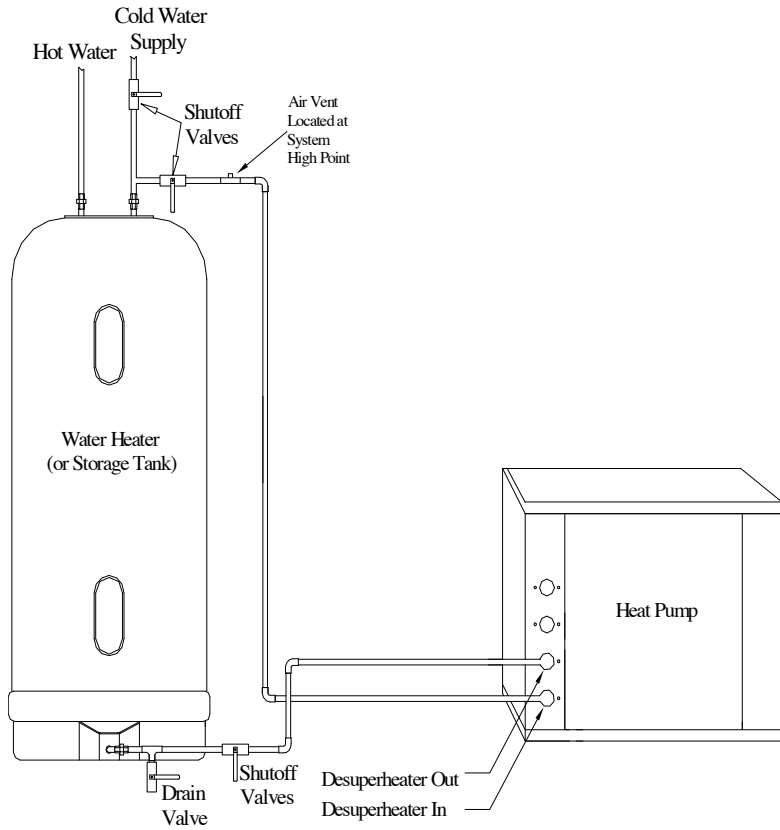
Water Heater Connection Kit Assembly for Bottom of Water Heater
